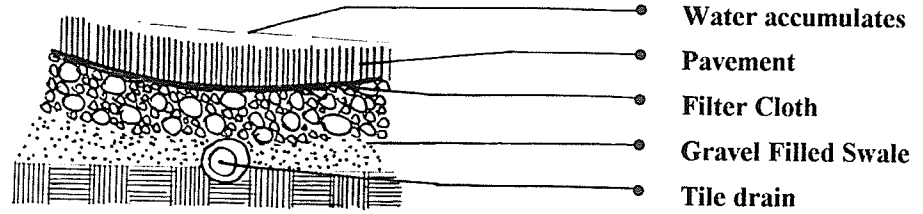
USE OF A TILE DRAIN WITH POROUS PAVEMENT
